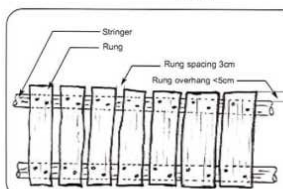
BRIDGE RUNG SPACING, RUNG OVERHANG
